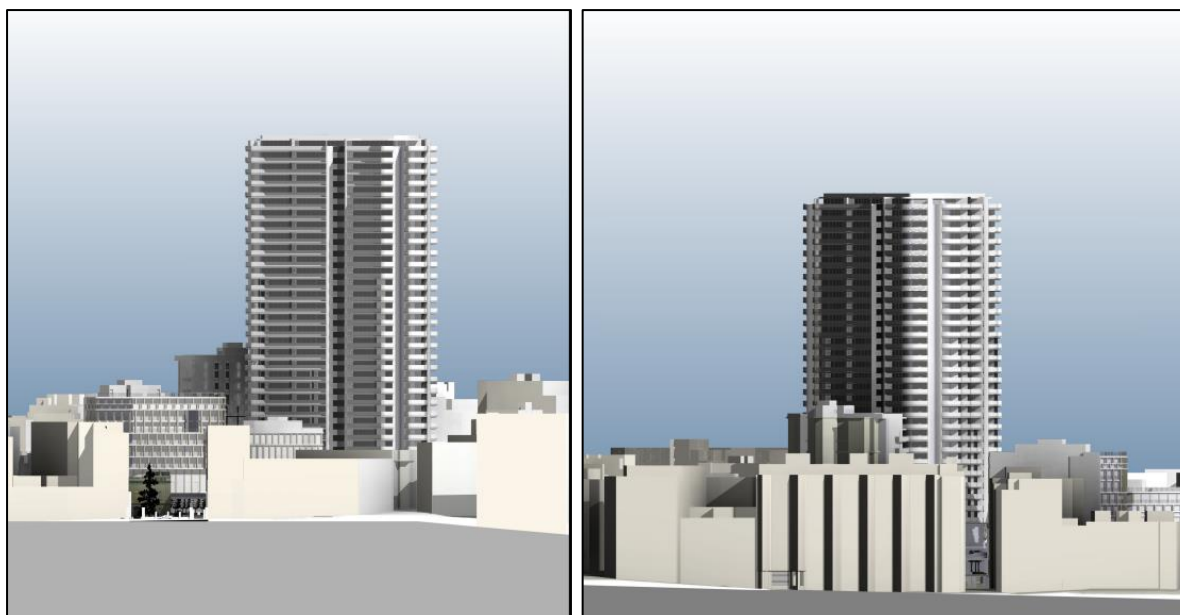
Elevation drawings of the proposed development – left: elevation as seen from Triq it-Torri [proposed hotel on the left of residential tower] – right: elevation as seen from Triq Qui-Si-Sana [proposed hotel in front of residential tower] (Source: EIA Coordinator Statement, August 2023, <https://era.org.mt/era-project/pa01191-05/>).
